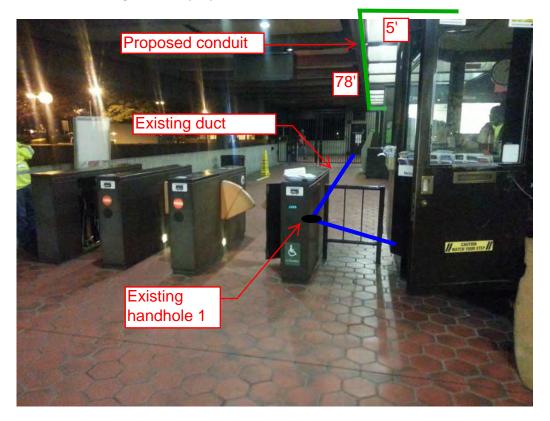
Existing duct and proposed overhead conduit on mezzanine floor
